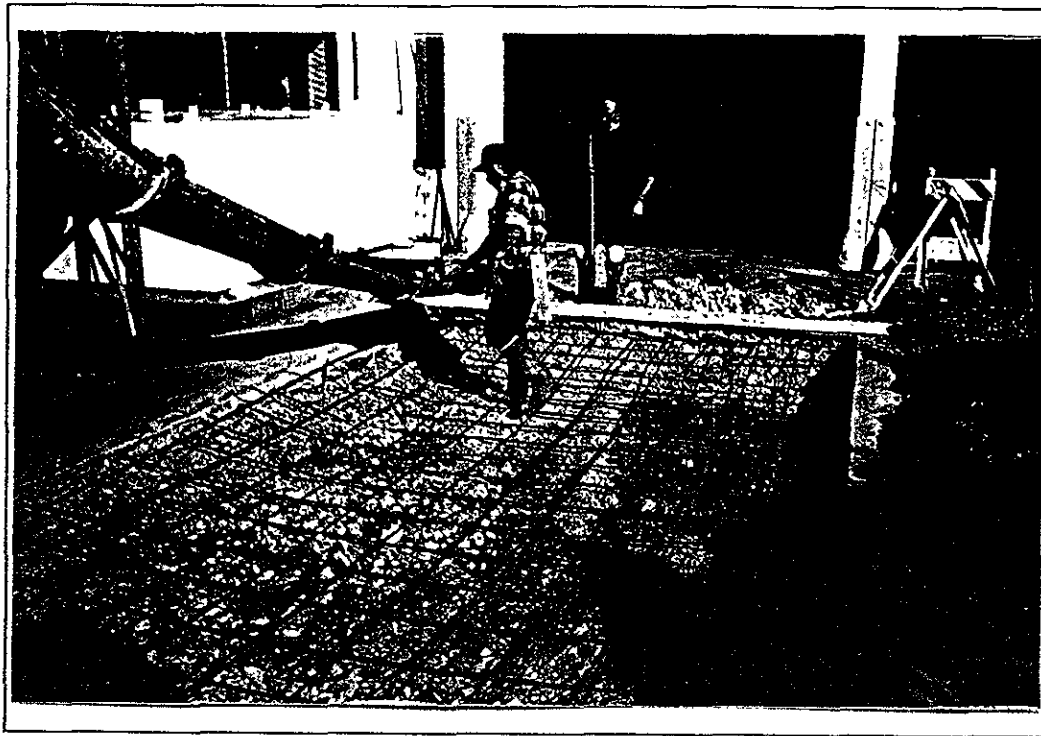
Photo J : Foundation preparation for the concrete pad for the waste oil UST.
